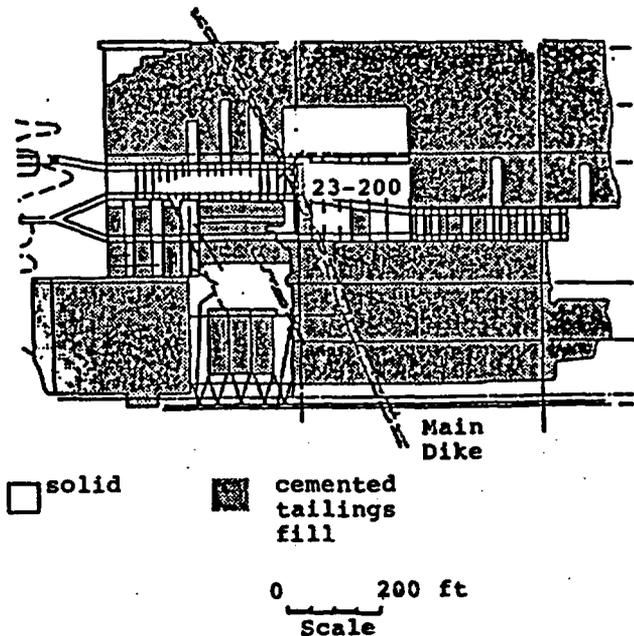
Longitudinal Section of the Strathcona Mine Showing the Location of the Main Mine Sill, the 200 Panels, and the Main Dike Structure [Morrison, 1987]
